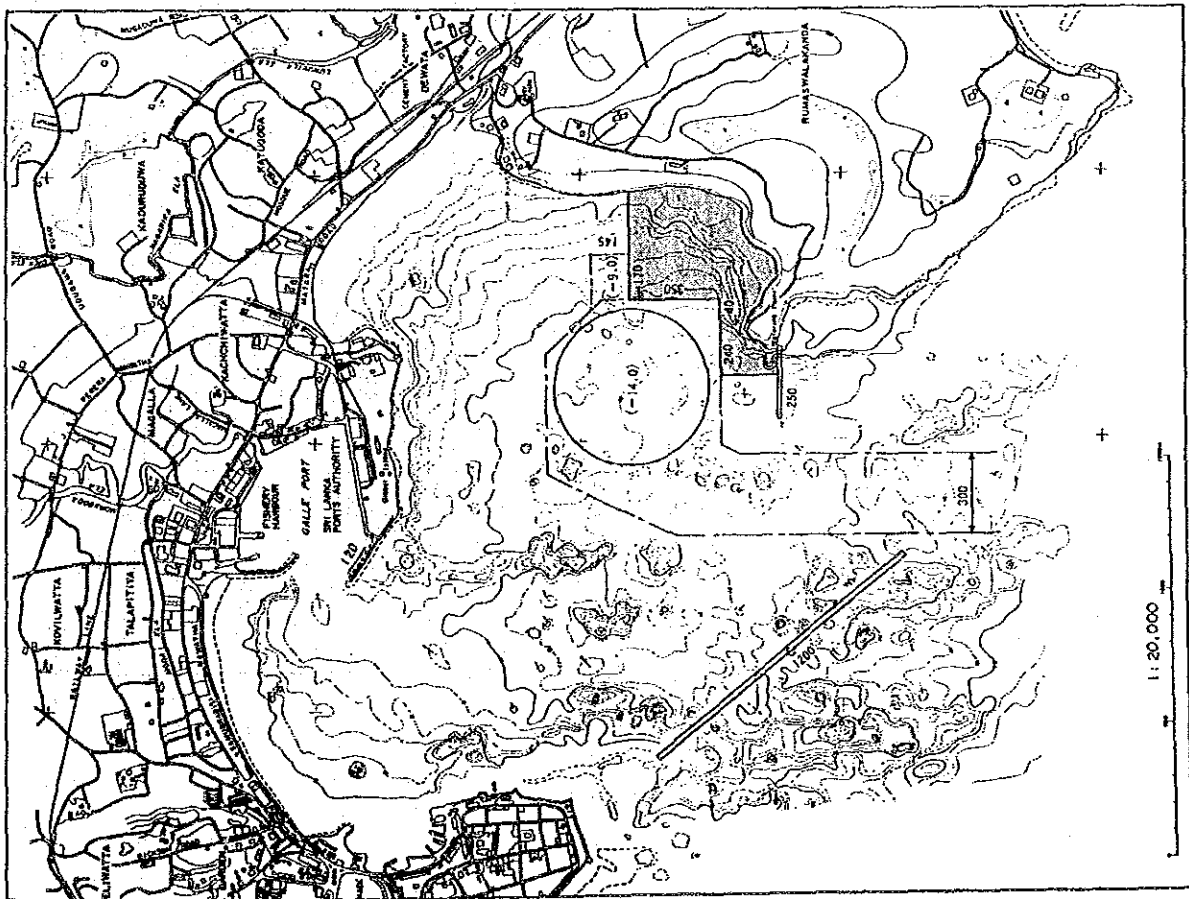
Short Term Development Plan (Alternative 1)
